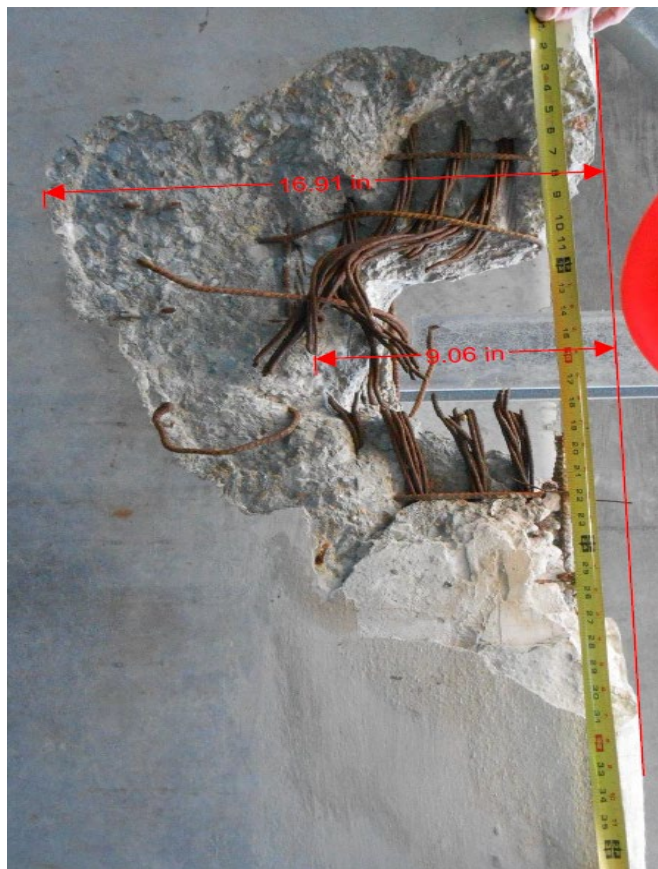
Level of damage, 168th St. over West Dodge Road Bridge, courtesy of NDOT
